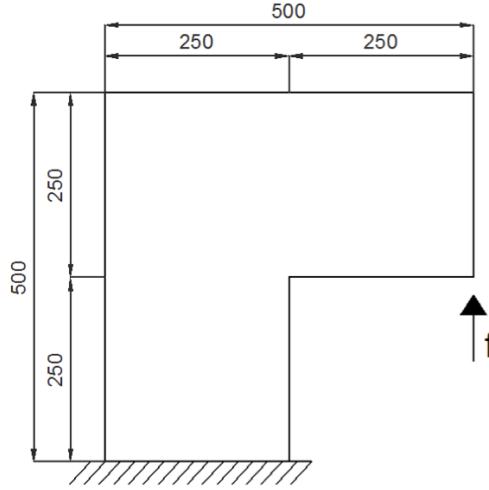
Experimental set up for the L-Shaped fibre-reinforced concrete specimen (units: mm).
